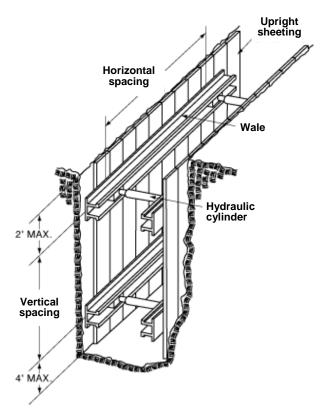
Hydraulic shoring in Type B soil: waler system
